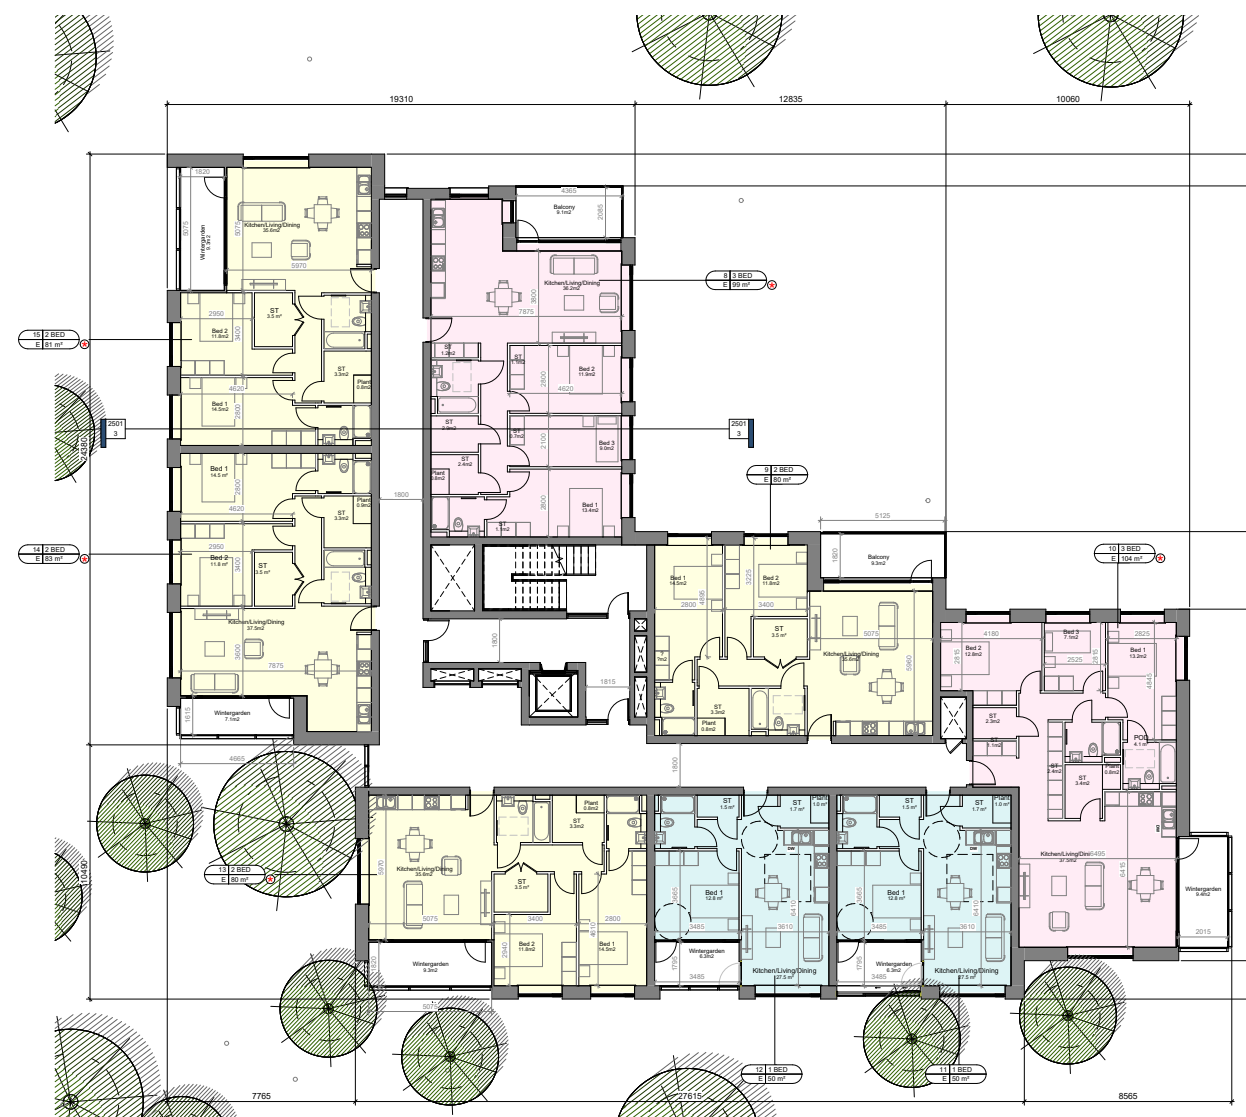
Block E- Second- Fifth Floor Plan Source: MCORM, 2026
